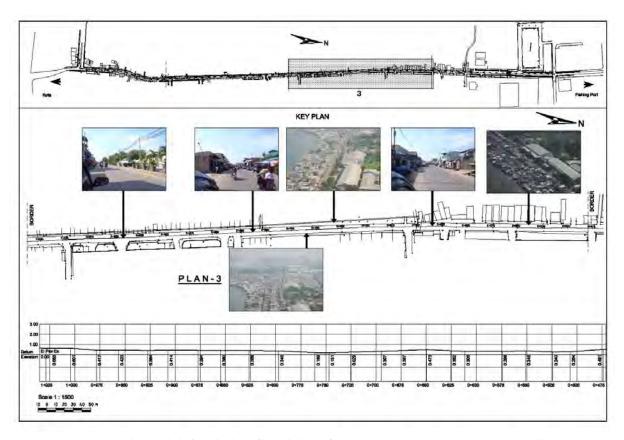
Existing Condition of Access Road (Jl. Muara Baru) (3)
